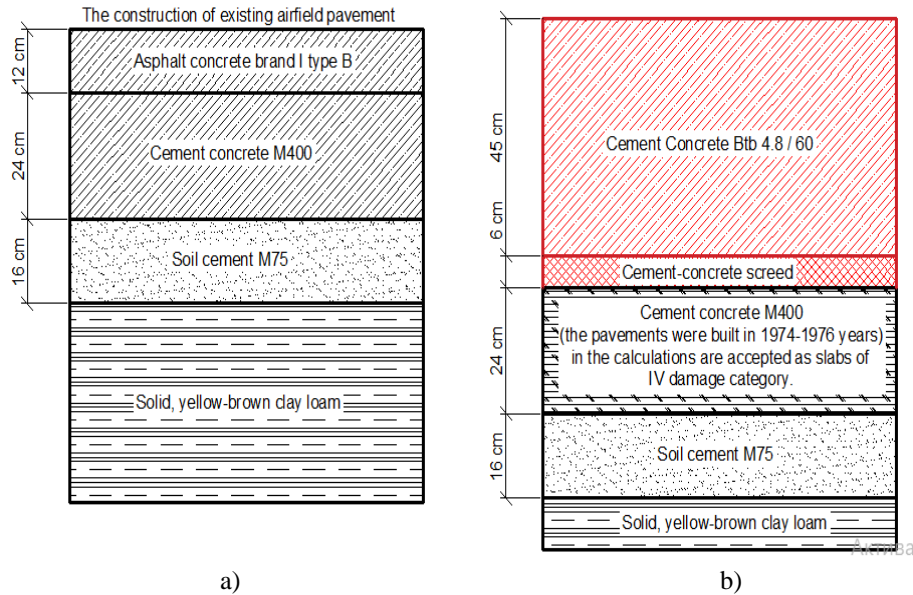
Airfield Pavement Constructions of International Airport «Mykolaiv»: a) Existed Construction; b) Proposed Construction.
